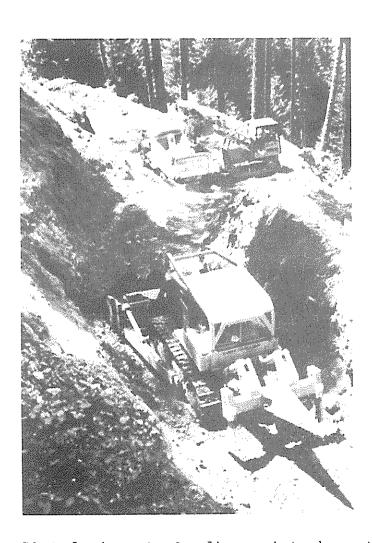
Slot dozing, to loading point where traxcavator loads trucks for endhaul
